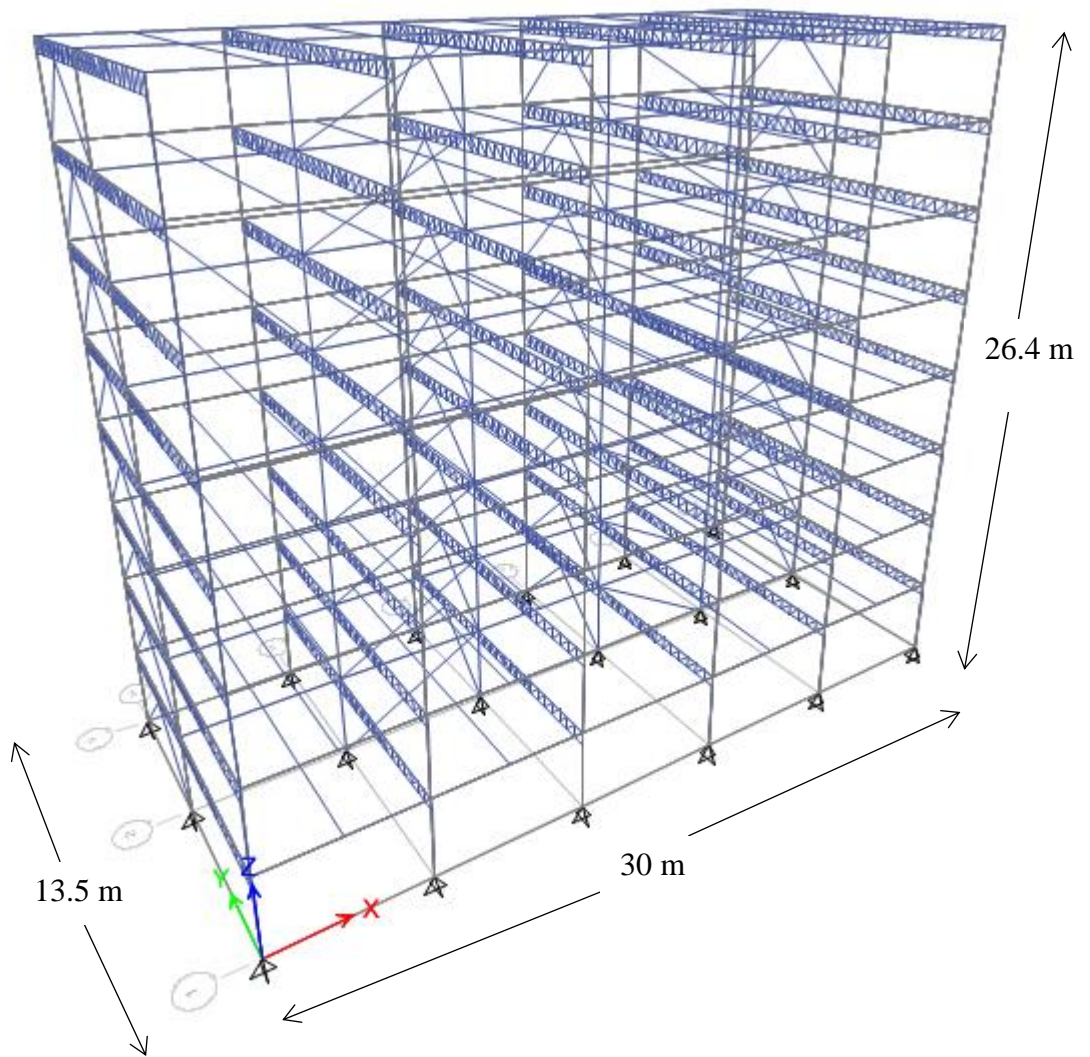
General 3-D view of the dormitory building (IR4F-T).
